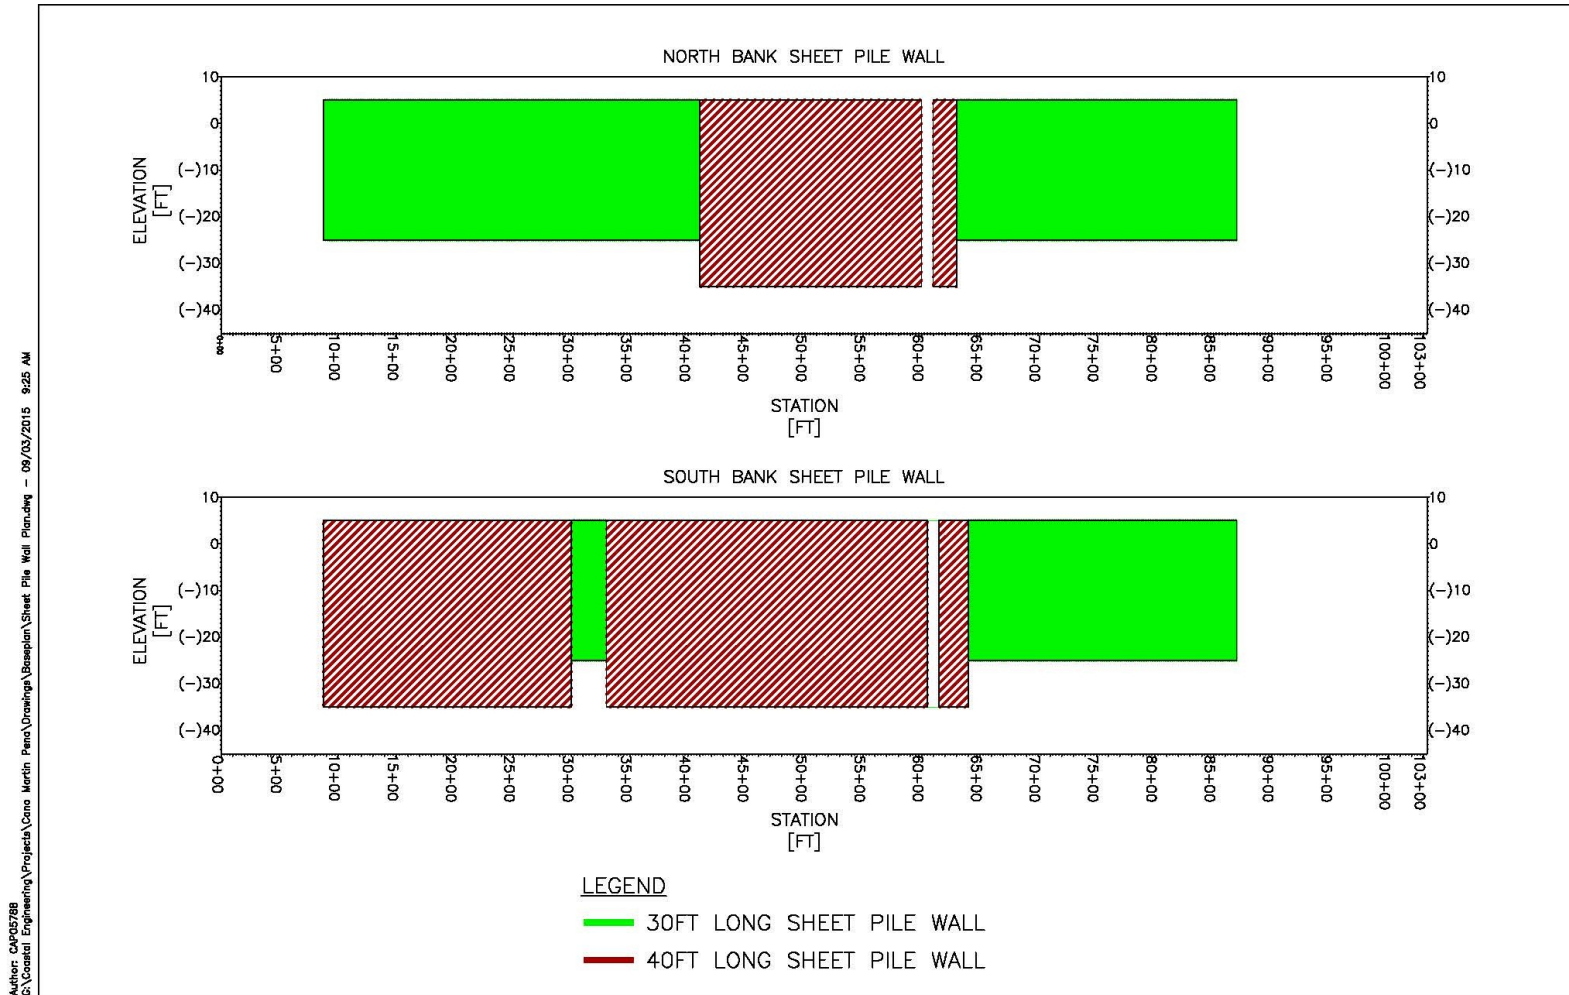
Sheet Pile Wall Elevation, 15-foot-deep Channel
